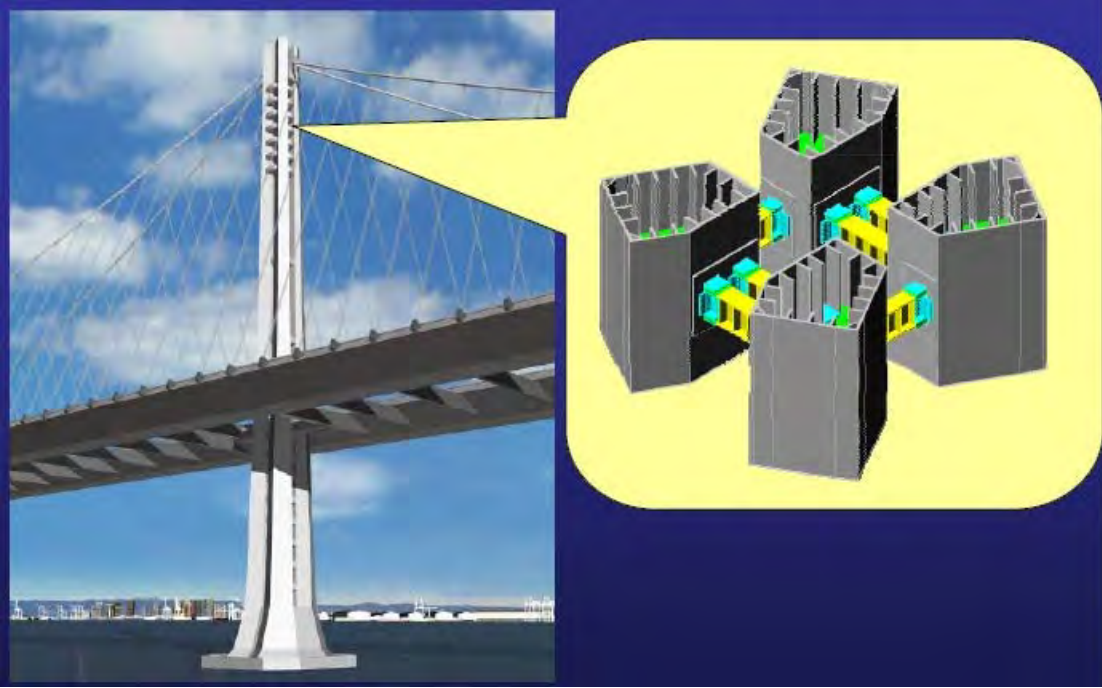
Bay Bridge Towers with shear links (El-Bahey and Bruneau, 2010)
